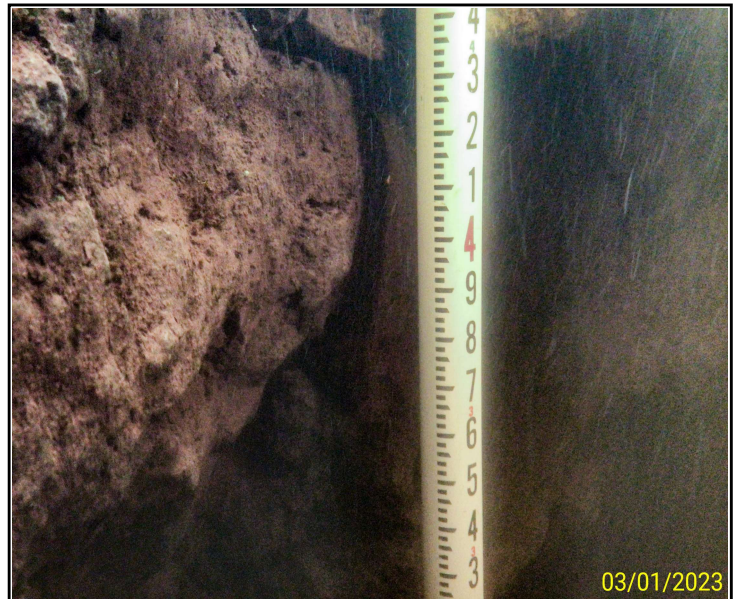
Bent 5, Column D, looking south. Scour below rock formation, 3' H x 1.5' D, CS3
